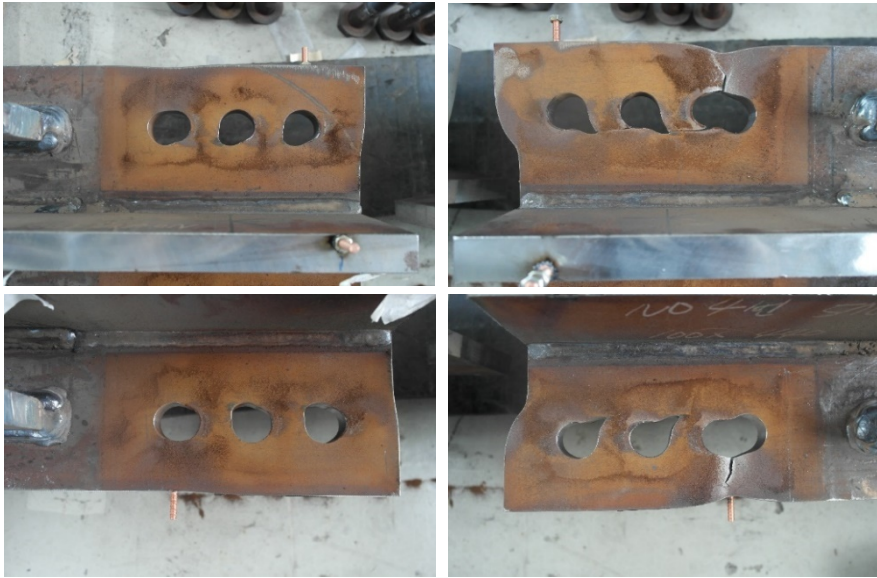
Block Shear Failure of Specimen 25T-570-3-60
